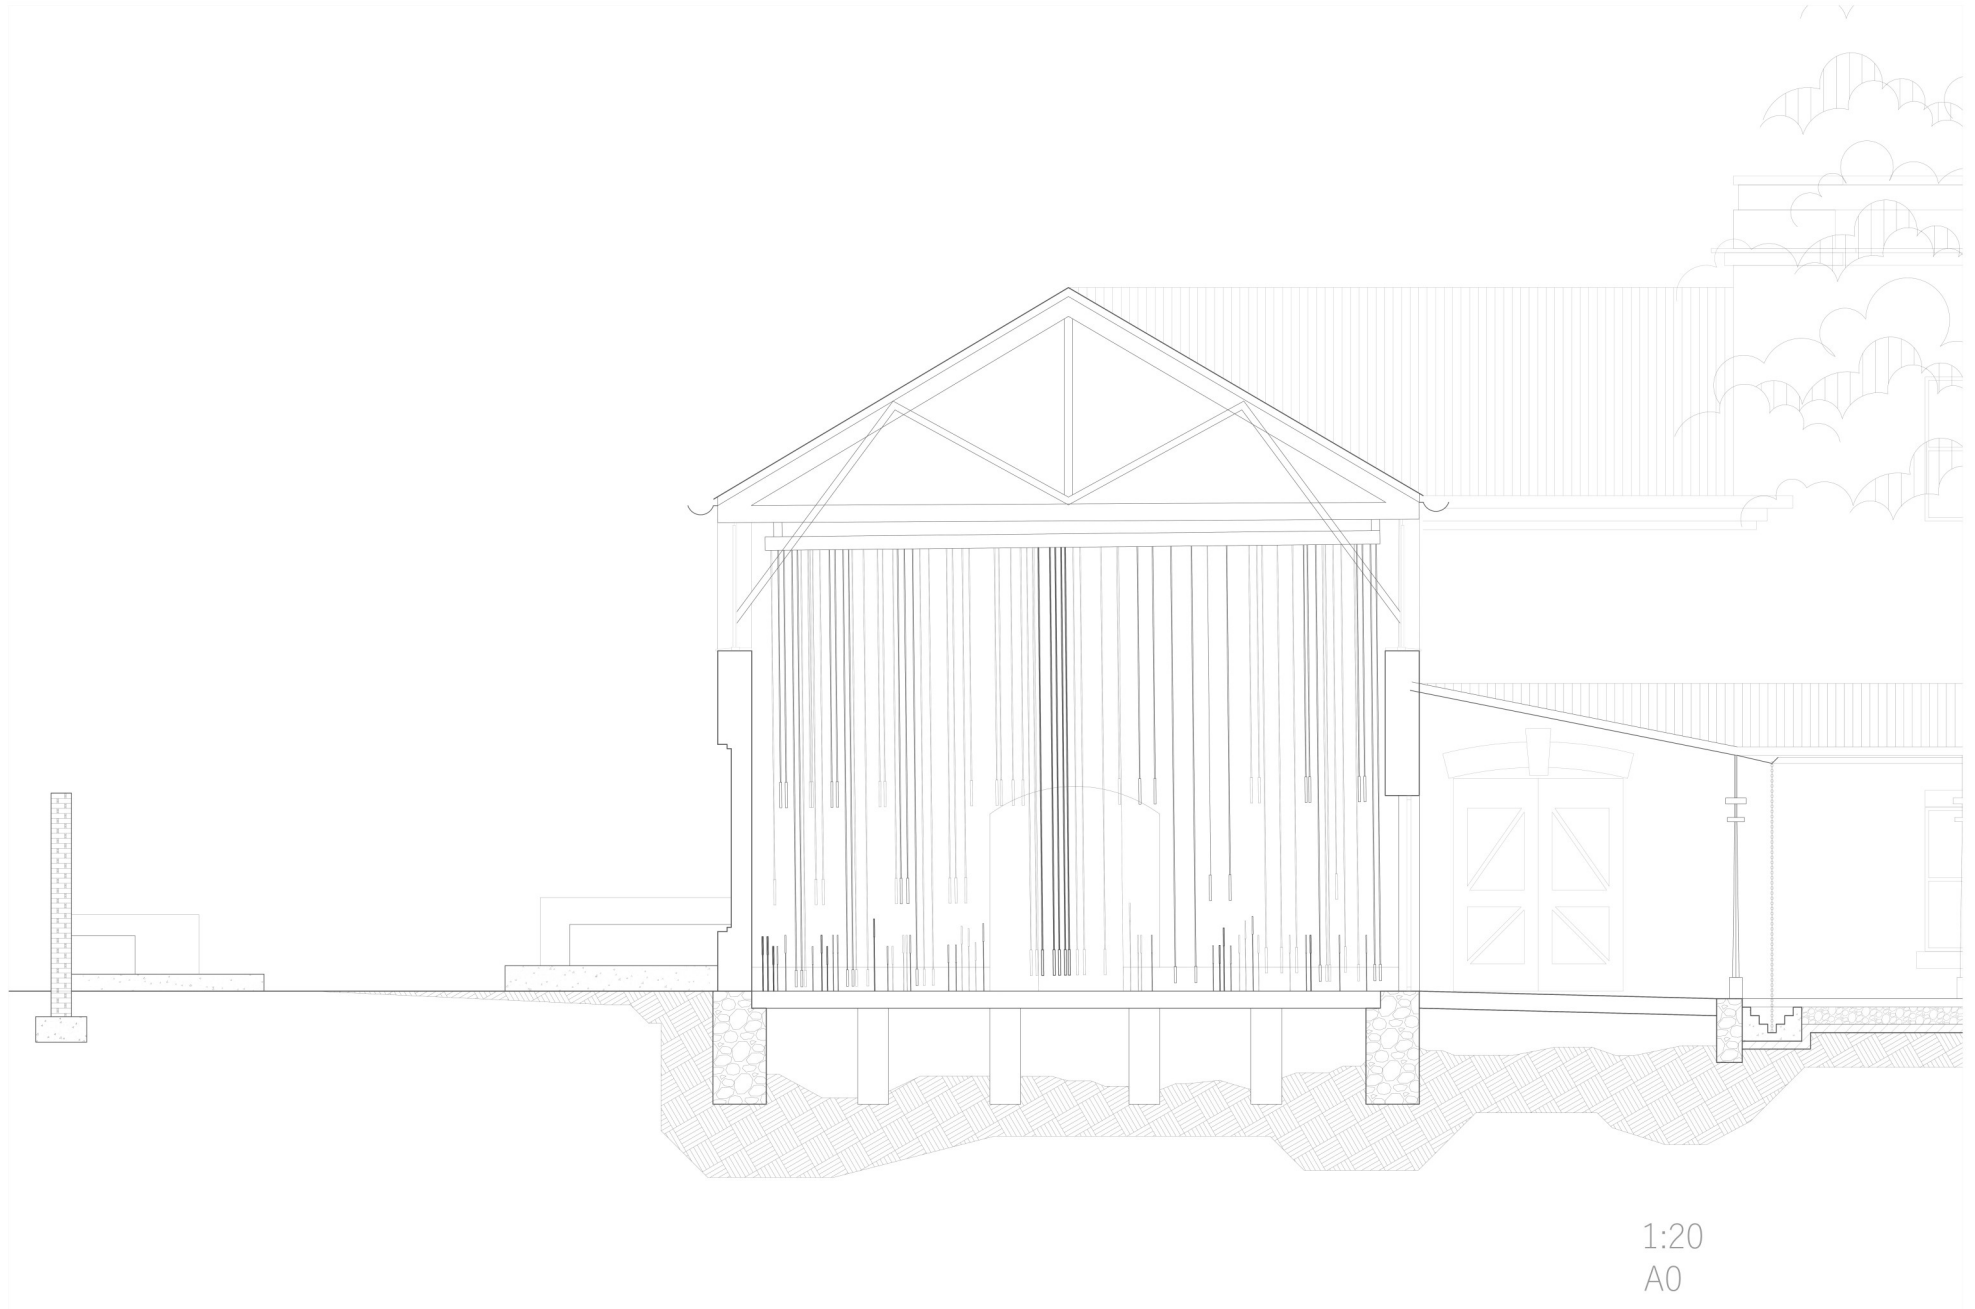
Proposed Section from east wing to west wing through Staatsmuseum 1:20 (Author 2020)
